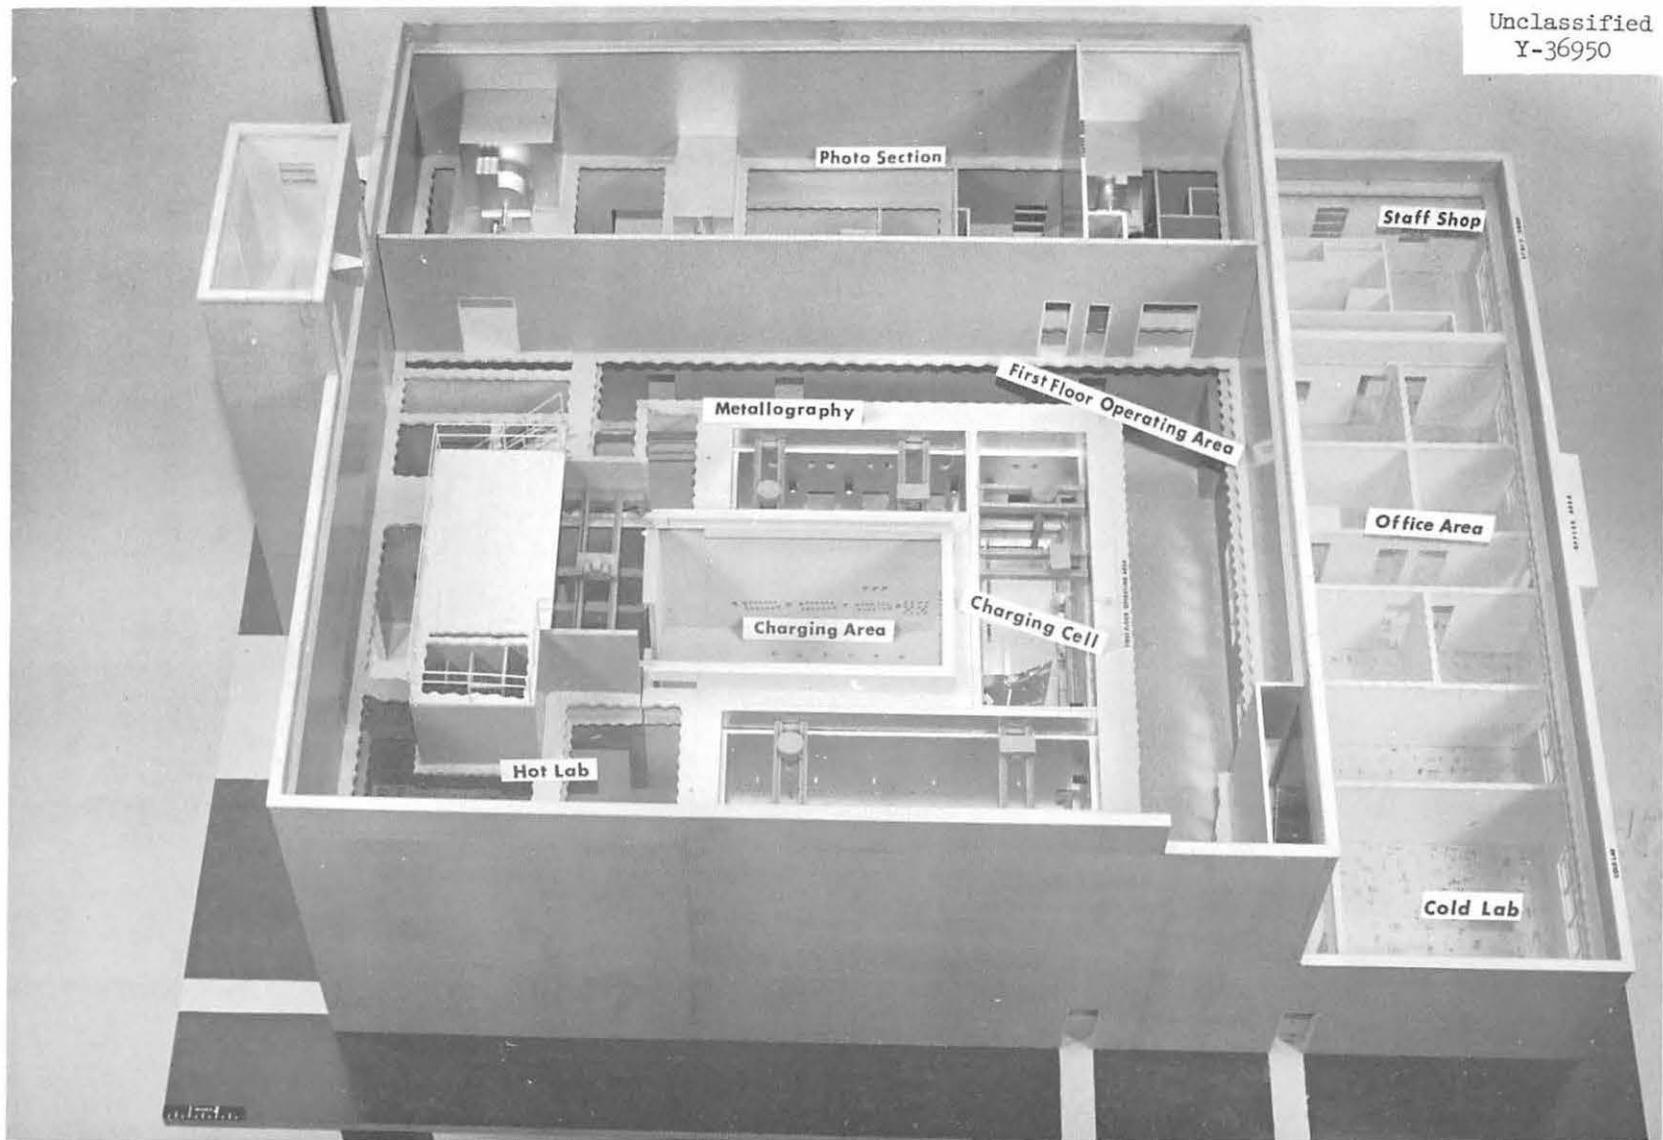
Building Structure and General Layout of Internal Facilities at Ground Level of the HRREL, Building 3525.
